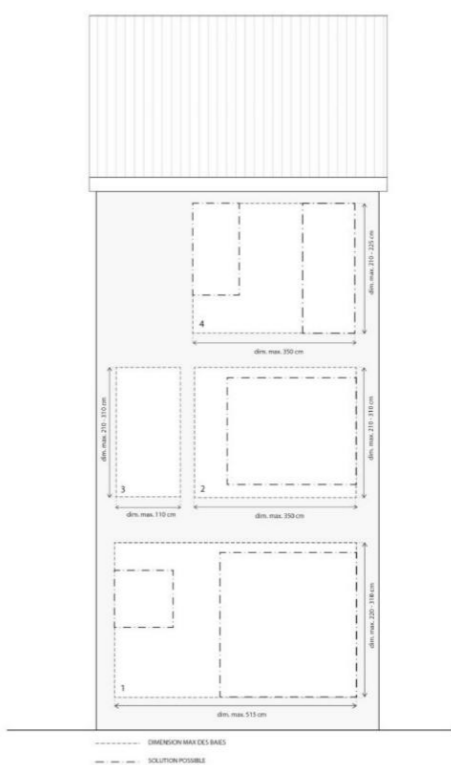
(Looking Through The Facade | Rotor, 2021)
